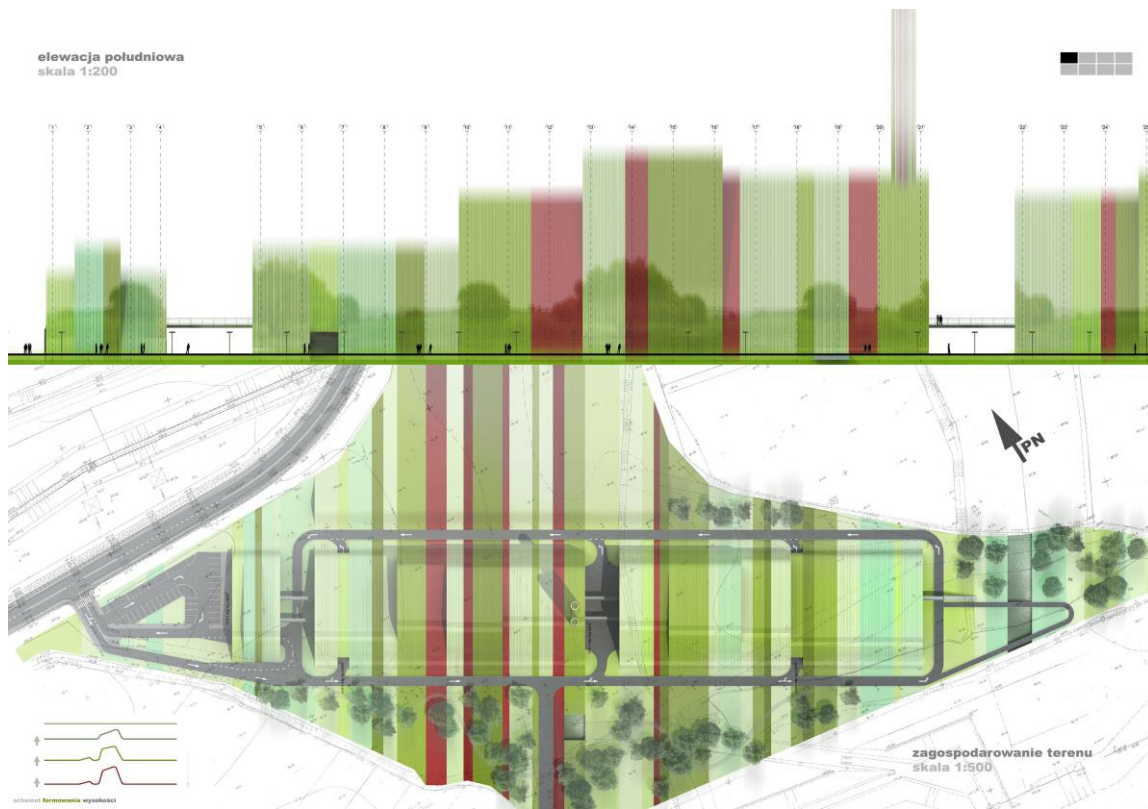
Waste incineration plant in Krakow – plan and elevation.
